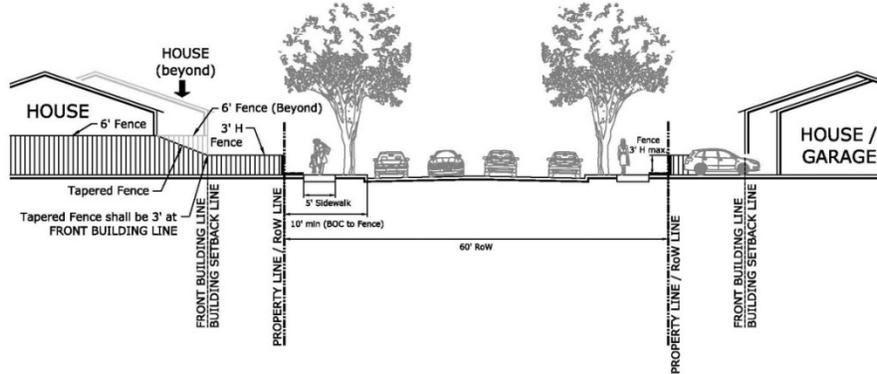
(c) – Typical Cross Section with Landscaped Area and Sidewalk
